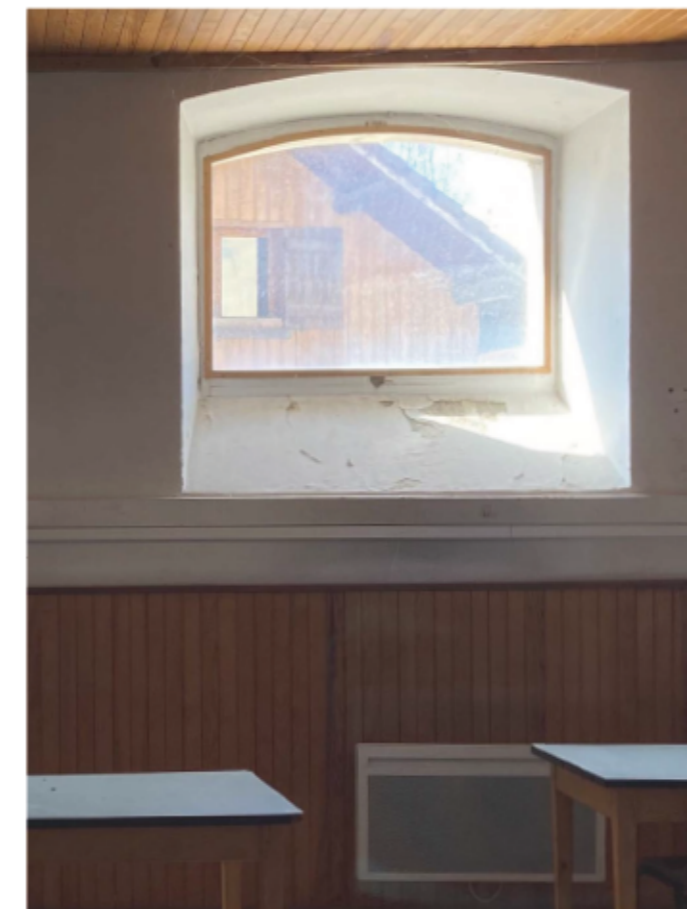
We can see the thickness of the load bearing walls on the ground floor (80cm).
